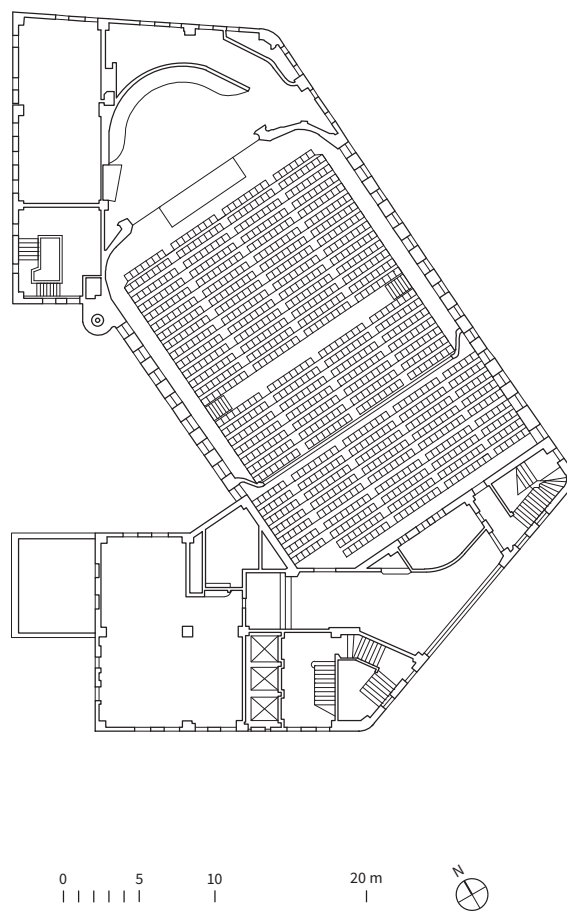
Floor plan of the auditorium of the Tokyo Asahi Newspaper building, opened in 1927. The auditorium was located on the sixth floor of the building. Scale = 1:700.
